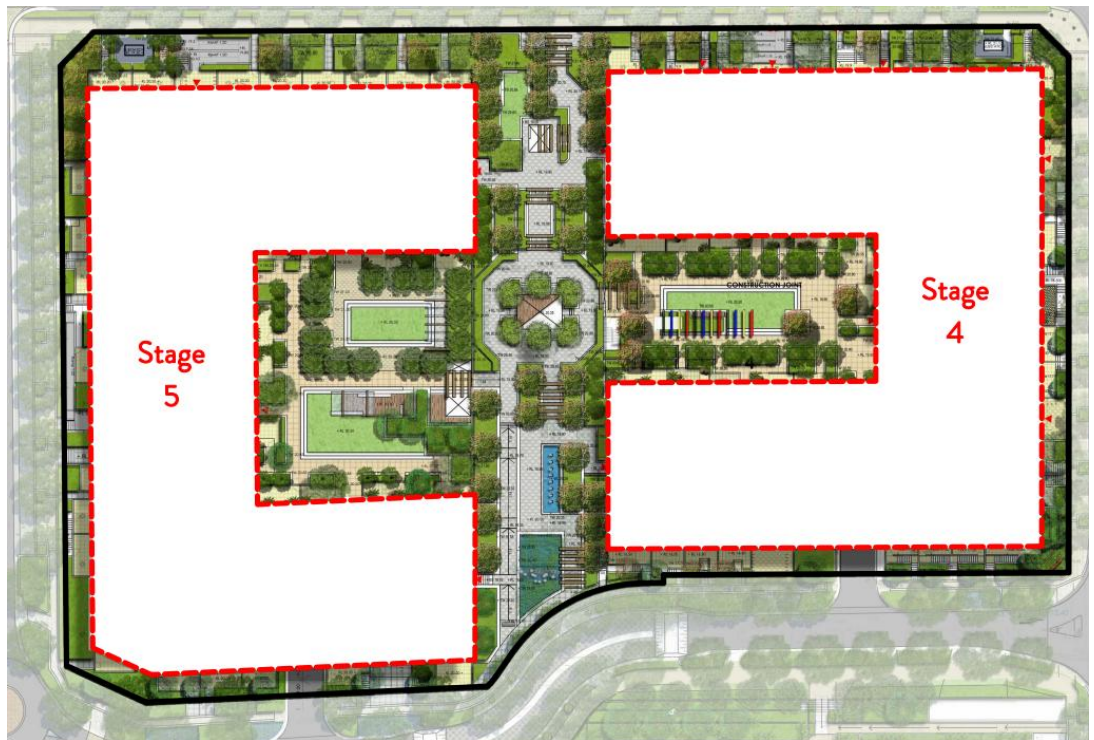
Extract from Site Plan prepared by R&M Architects detailing the building footprint of Stage 4 and Stage 5.
